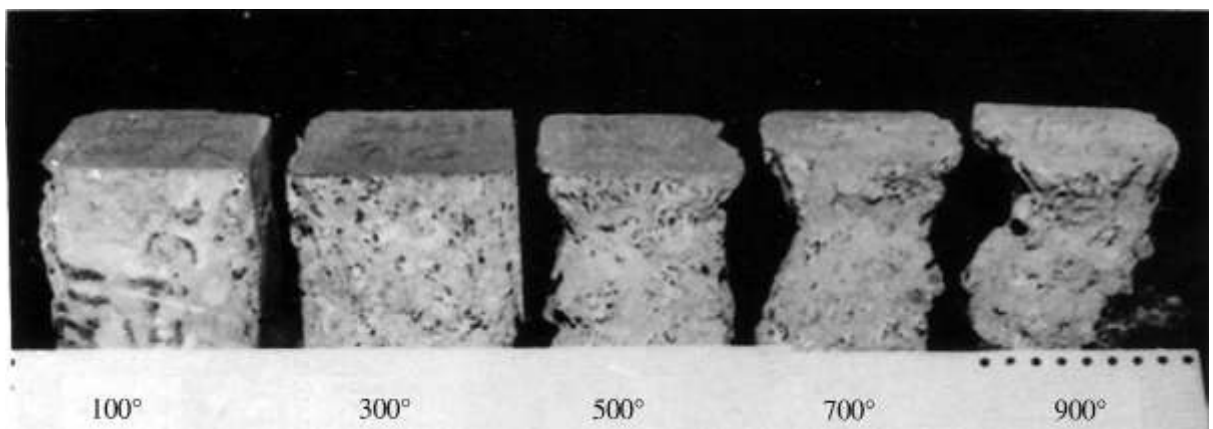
Failure patterns of compressive cubic specimens of concrete at elevated temperatures⁵⁰
